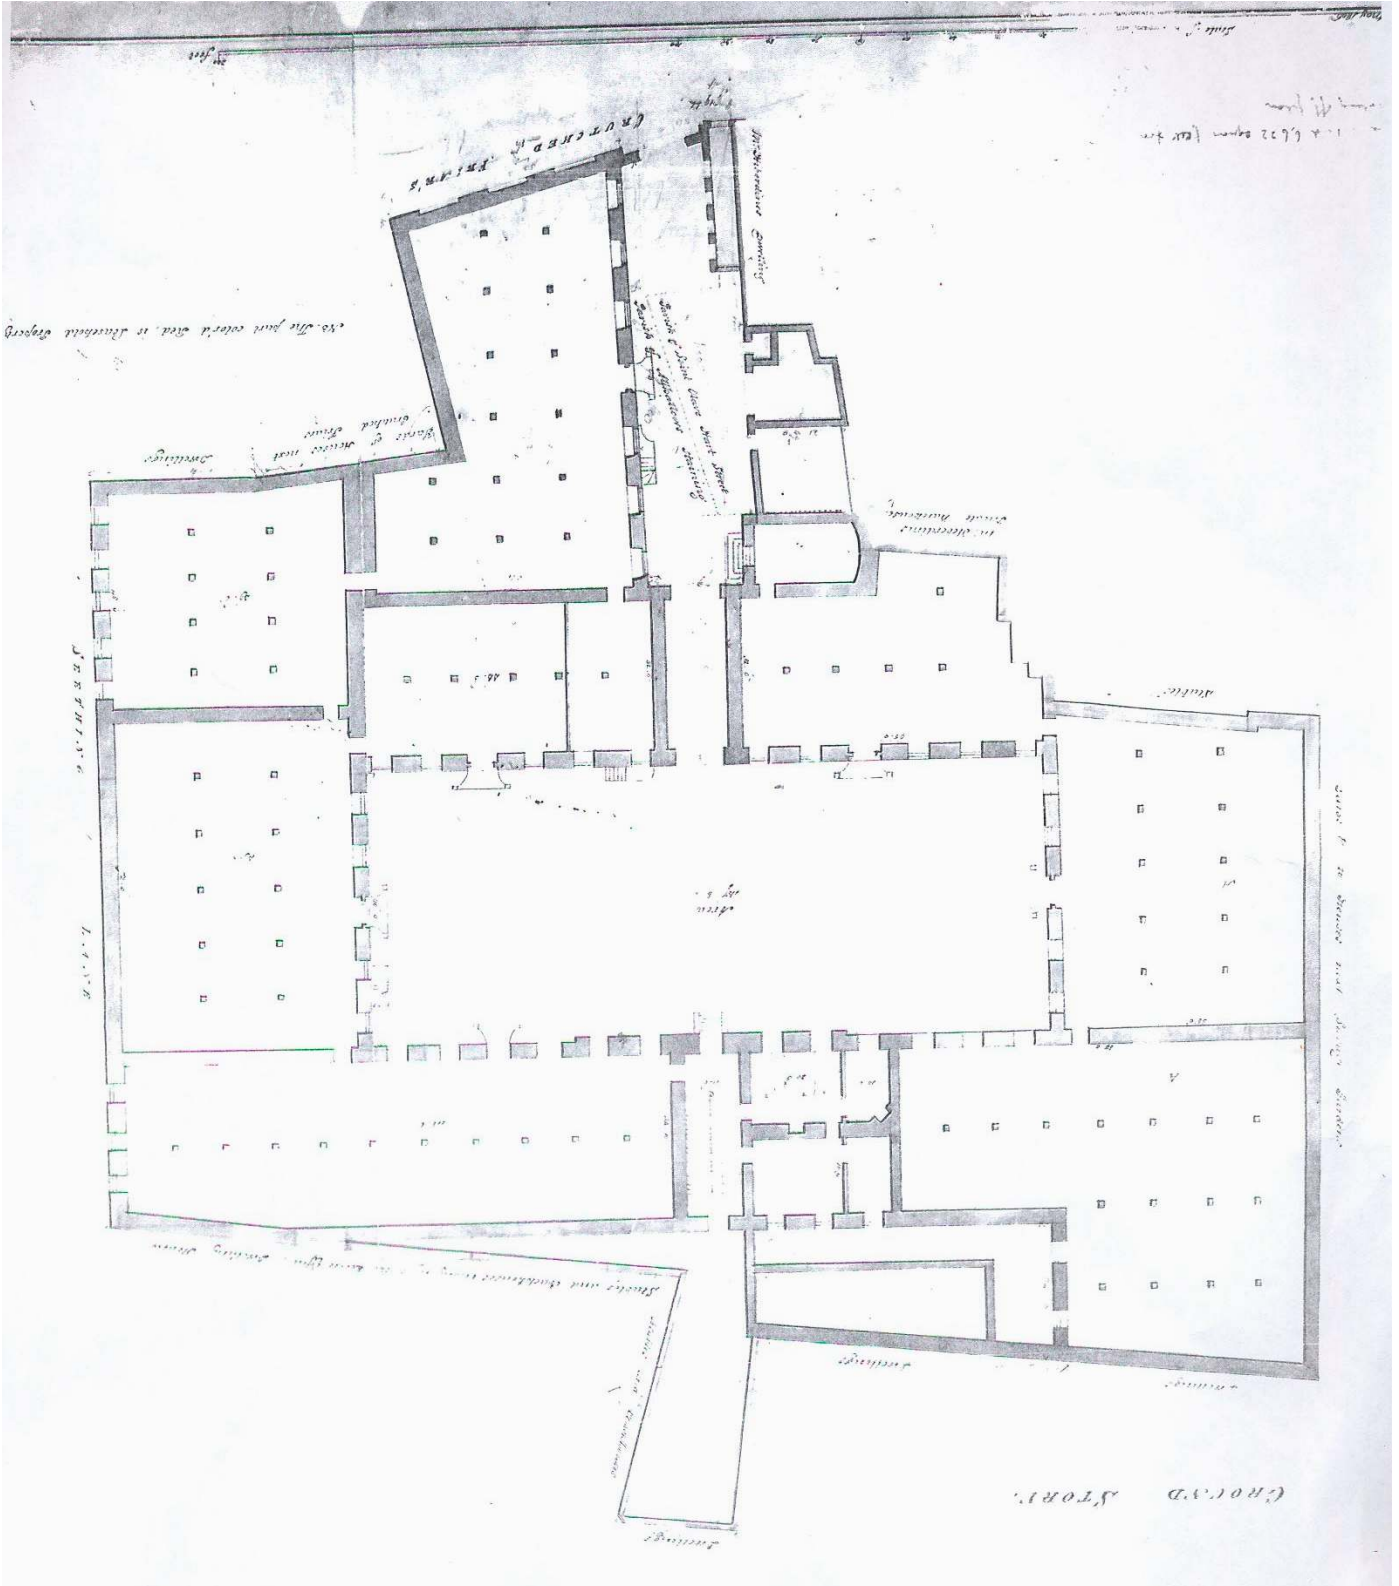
Plan of ground floor of warehouse, 1805 (re-orientated North)
